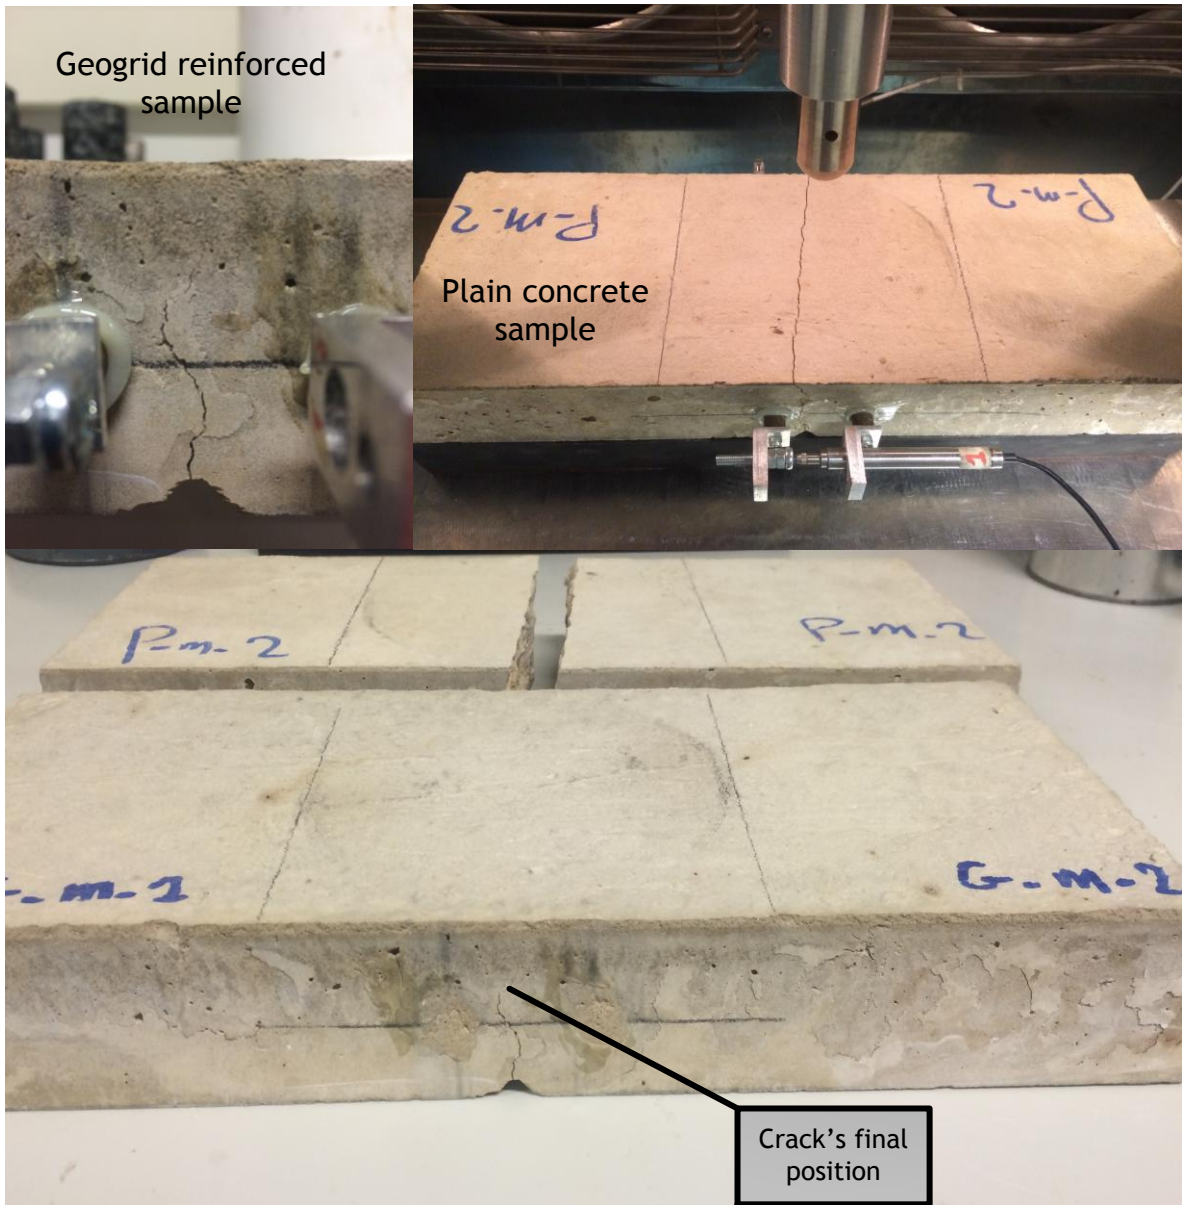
Plain Vs reinforced concrete failure mode under monotonic loading
